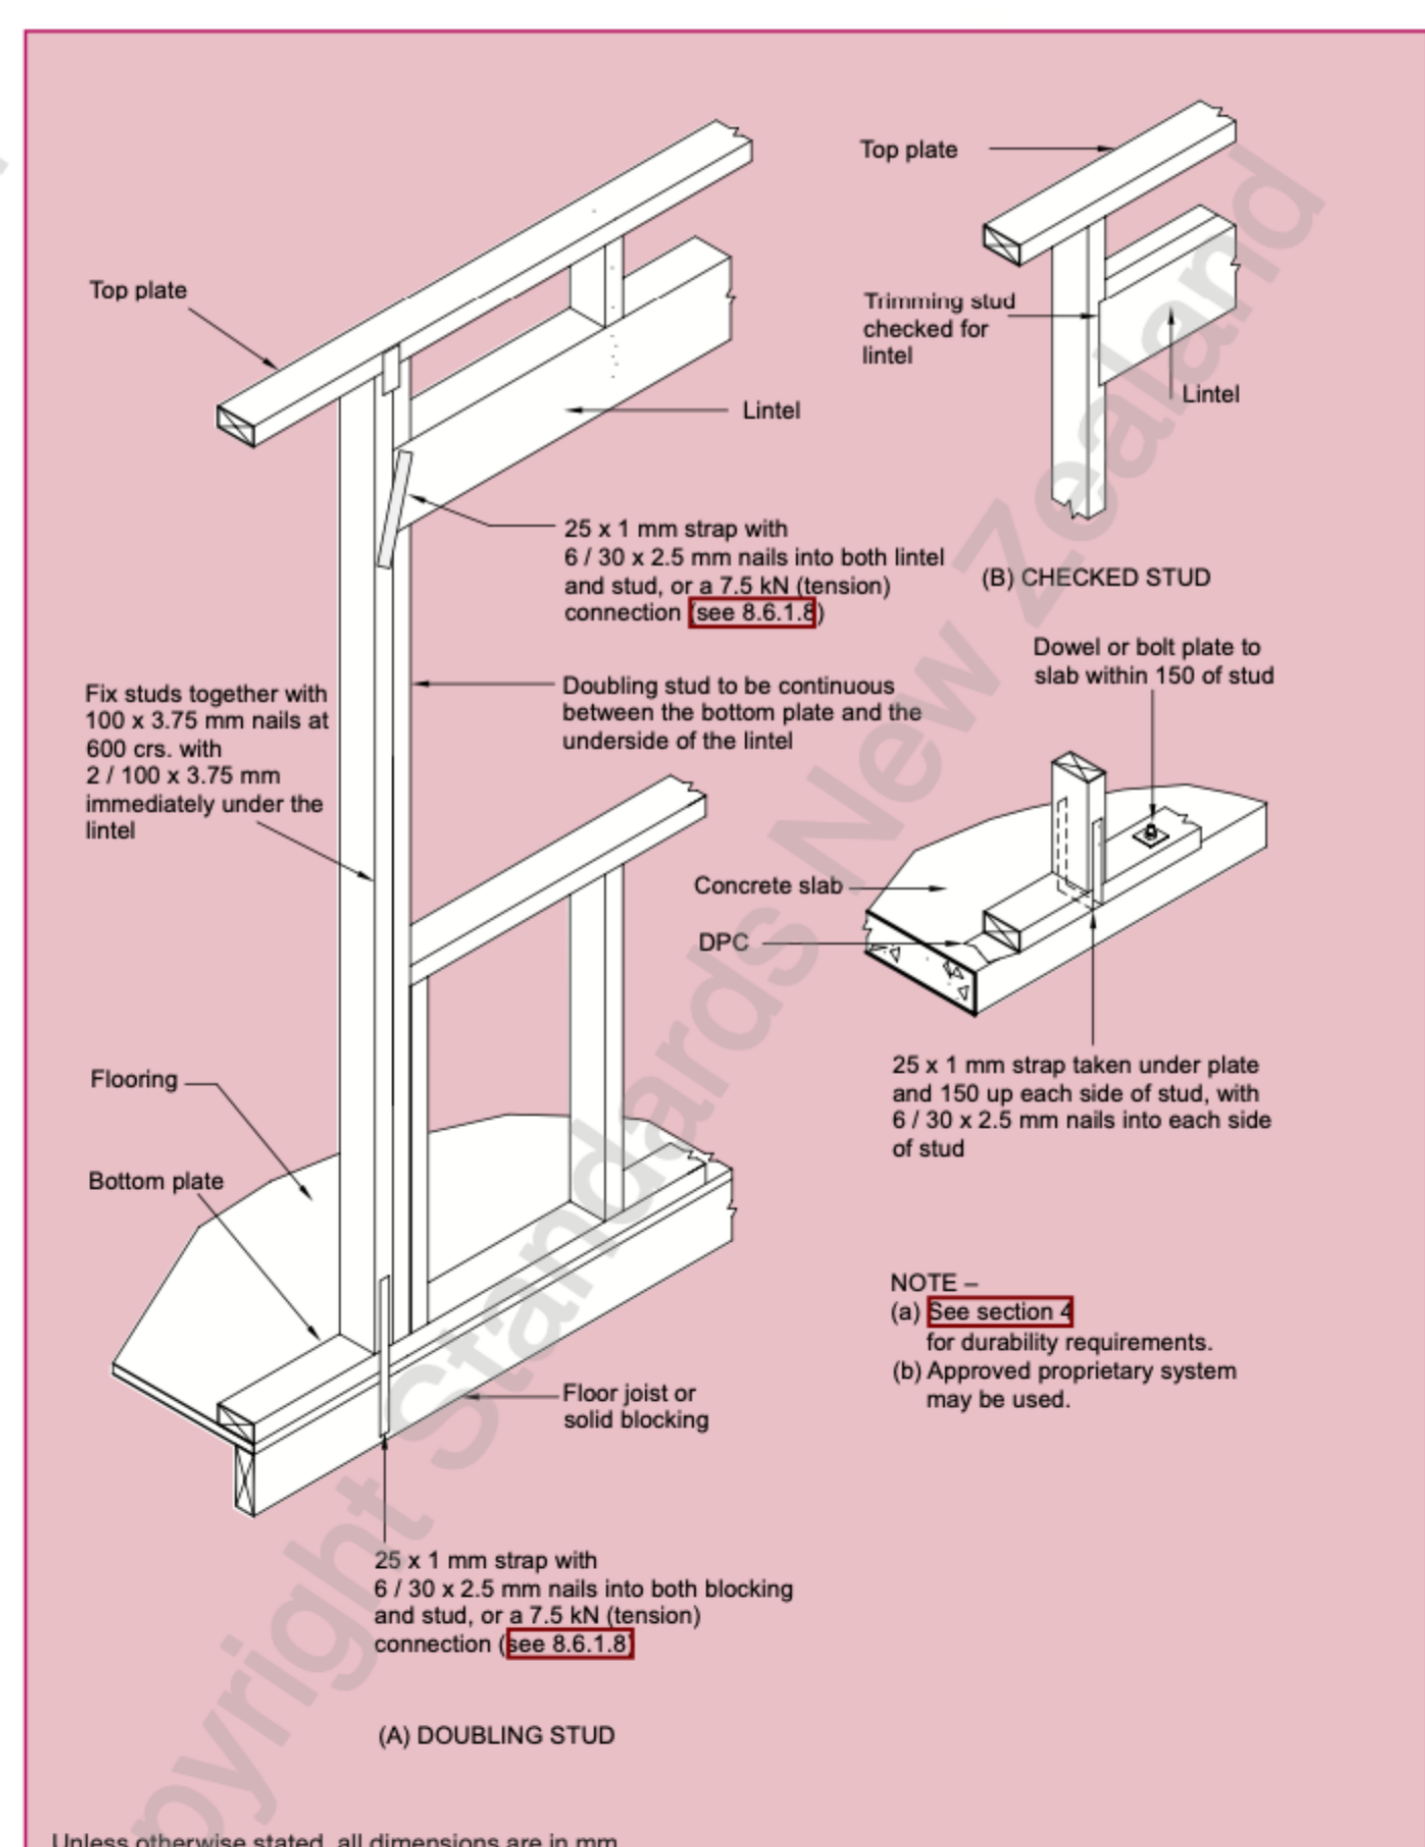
Lintel fixing to prevent uplift (see 8.6.1.8 and table 8.14 (a) and (b))
